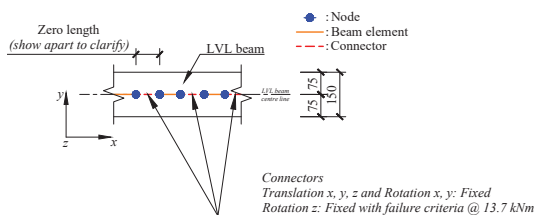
Modelling bending failure of LVL beams (unit: mm)
